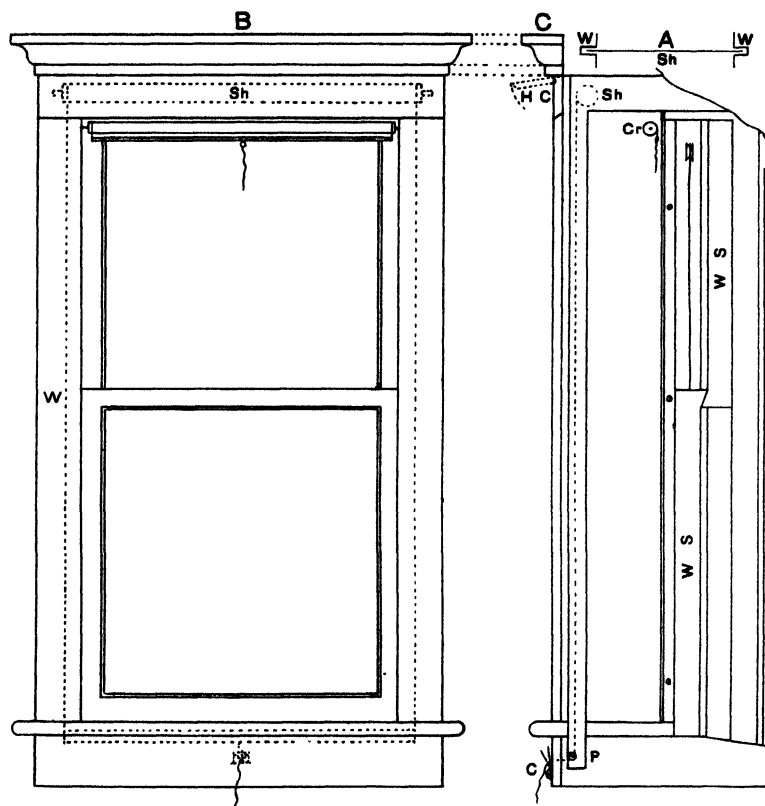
FACE AND SECTIONAL VIEW OF WINDOW SHADES PLANNED FOR IN THE CONSTRUCTION OF THE BUILDING.
